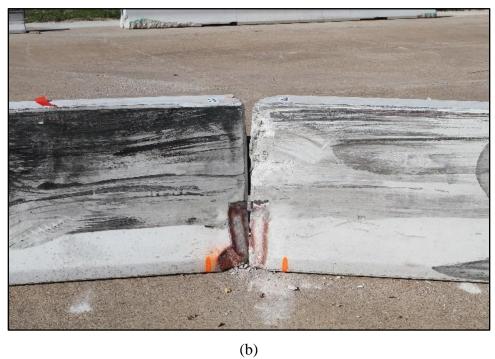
Damaged Portable Concrete Barriers after Test No. 440592-2.
